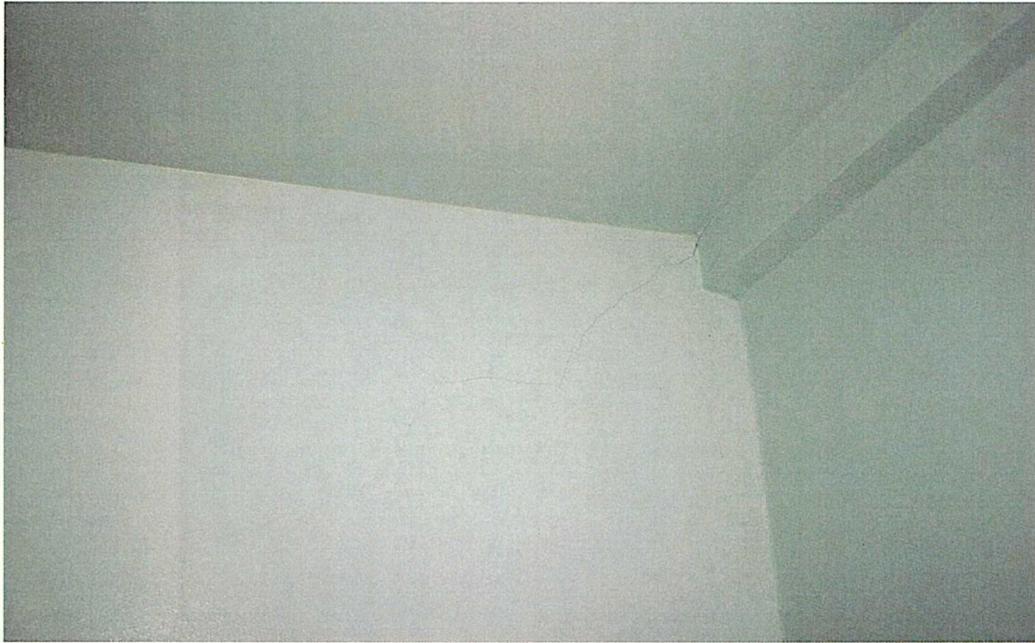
Typical Interior Wall at Intersection with Exterior Wall. Note minor diagonal plaster crack in wall.
